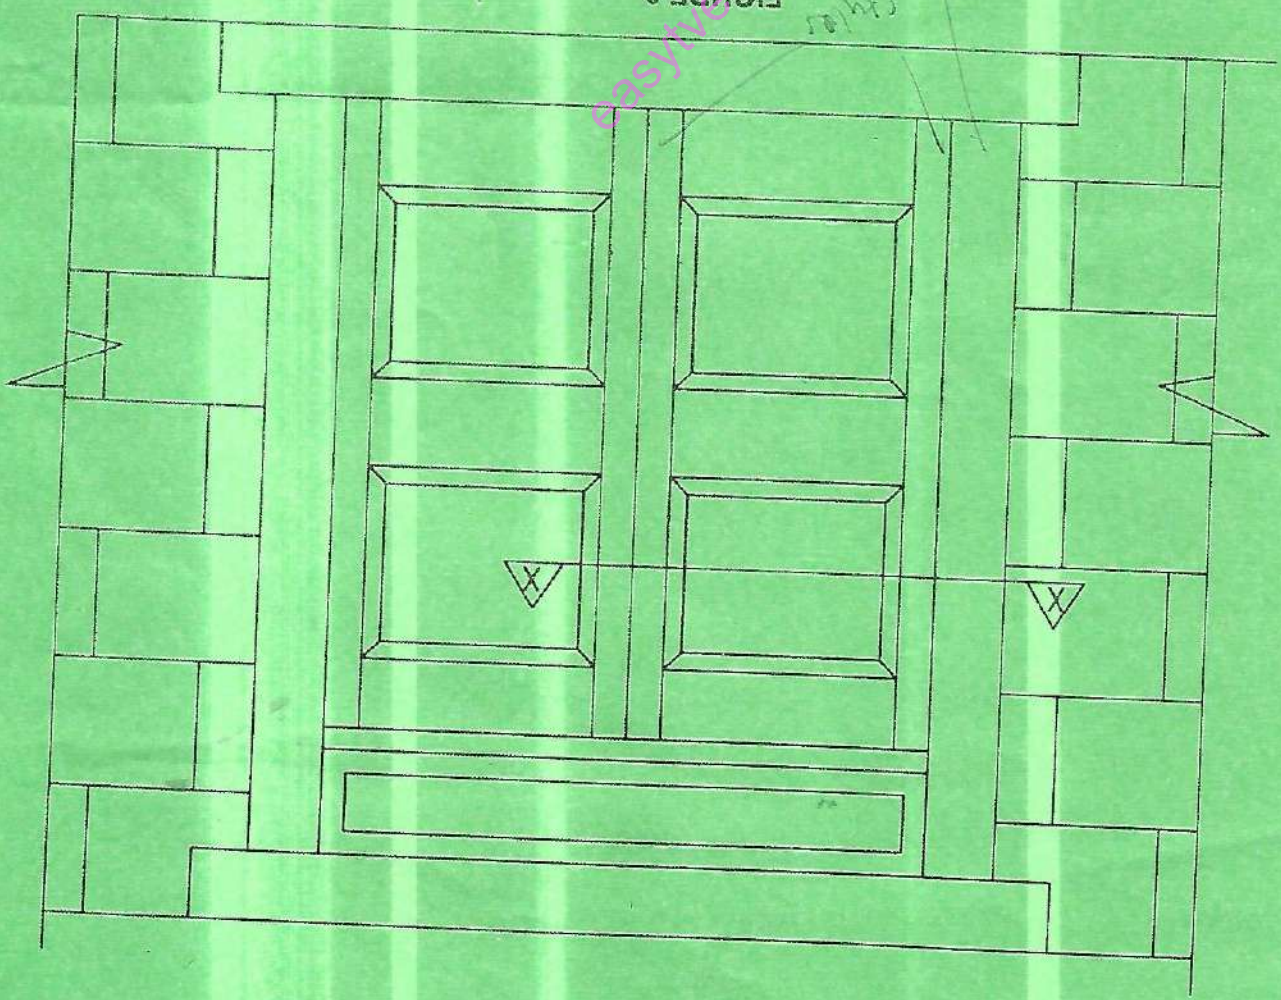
shows the elevation of a timber window in a wall opening. To a scale of 1 : 5 draw section X - X using the data provided.
